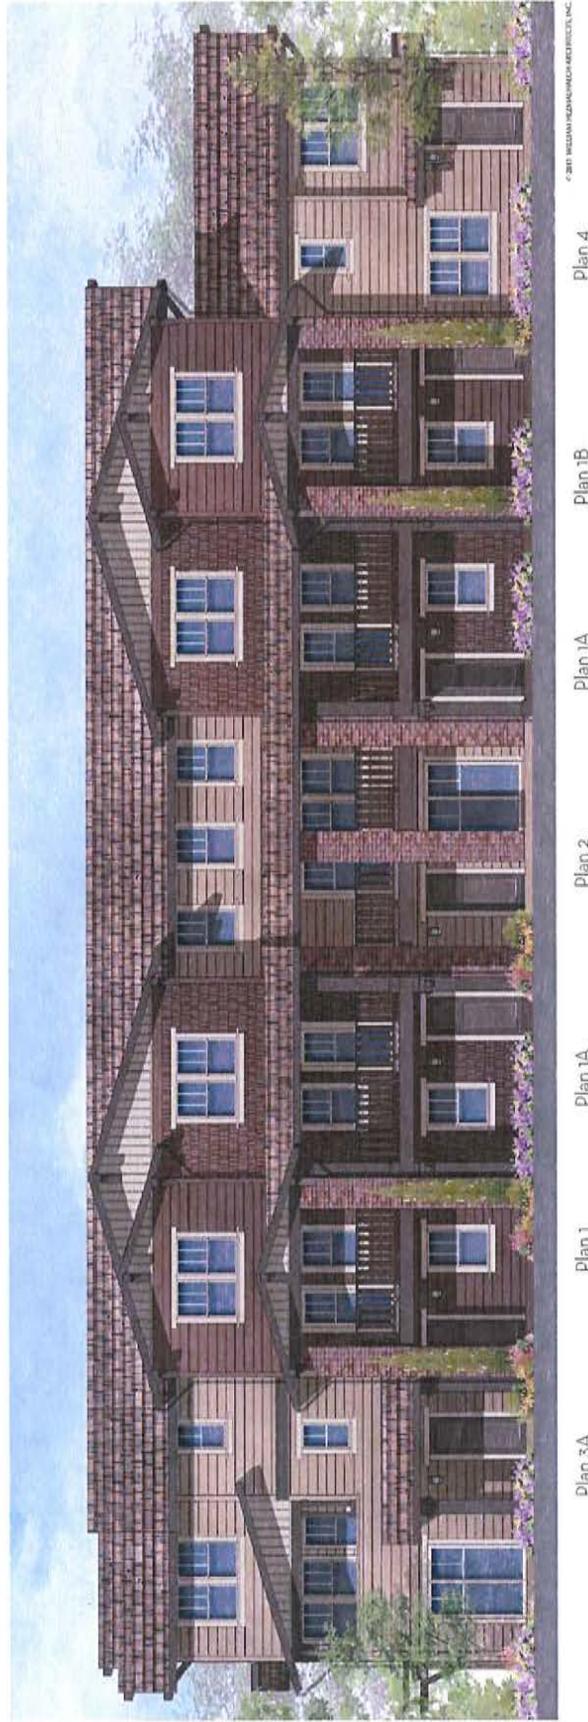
7-Plex Front Elevation—Building 4, 5, & 6
